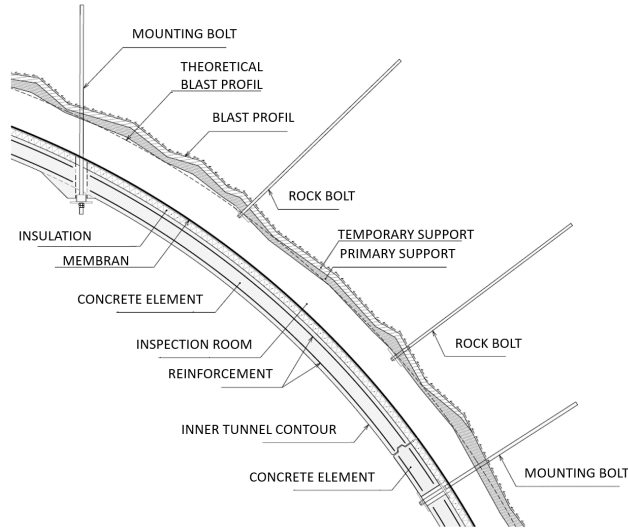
Traditional tunnel lining, suspended arch of concrete elements, reworked (Bane NOR, 2018a).
